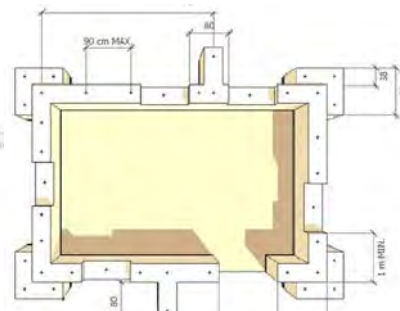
Lateral support for the wall (Geiger, O. (2015, September))
